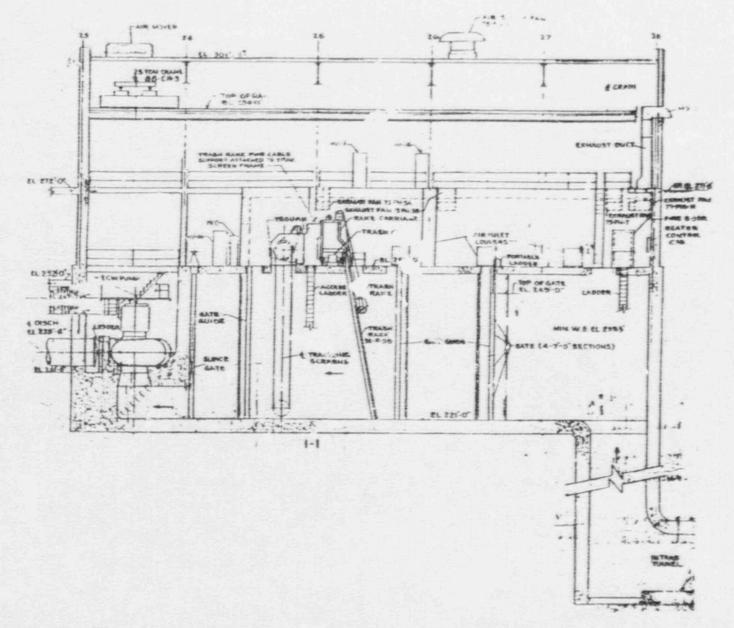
Fitzpatrick Screenwell and Water Treatment Building, Elevation View
